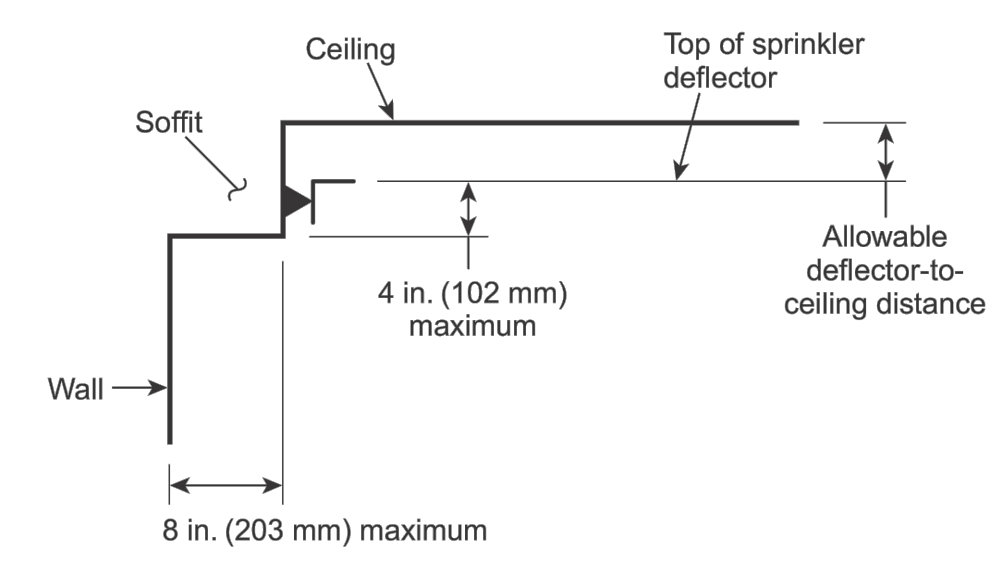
Location Sidewalls with Respect to Soffits - Sidewall in Soffit.
